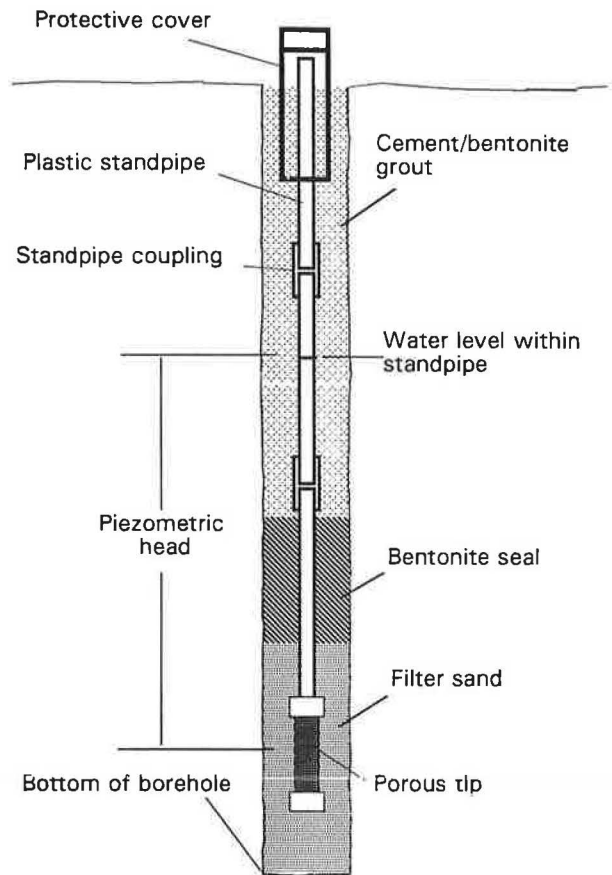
Open stand-pipe piezometer (Courtesy of Geotechnical Instruments, Inc.).
